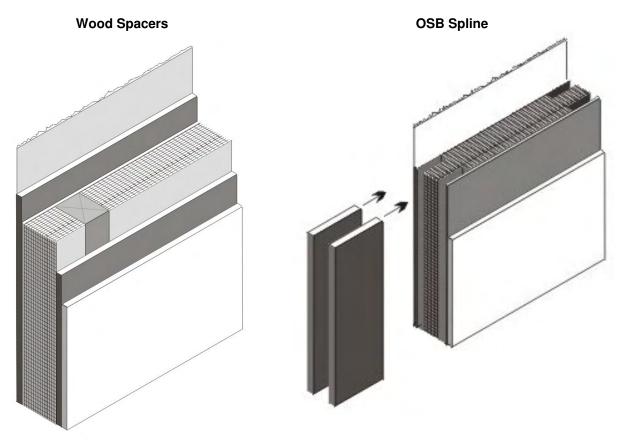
Structurally Insulated Wall Panels (SIPS) This figure shows just one way that panels are connected. Other options exist.
